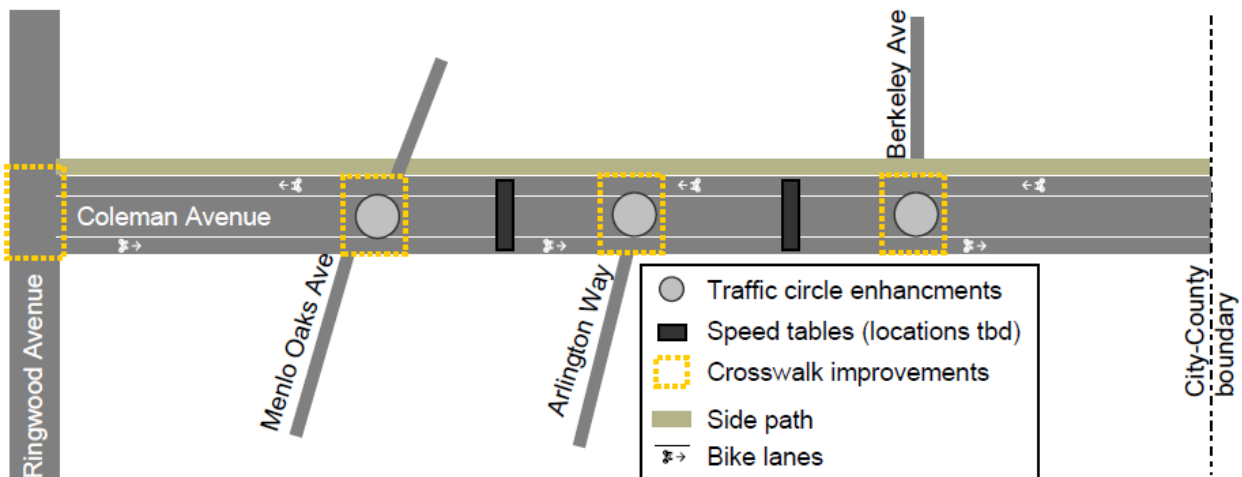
Coleman Avenue (Menlo Oaks) Long-term Plan View Schematic
